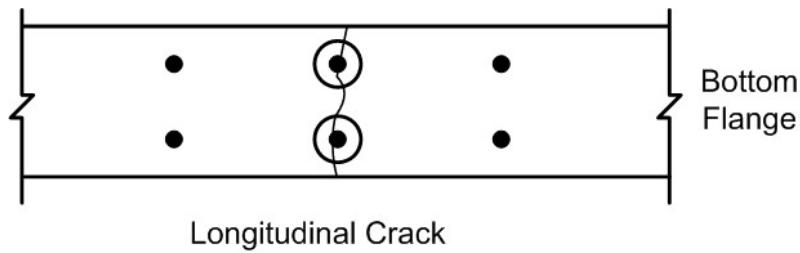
Prestressing Strands Corroded due to Crack Location
